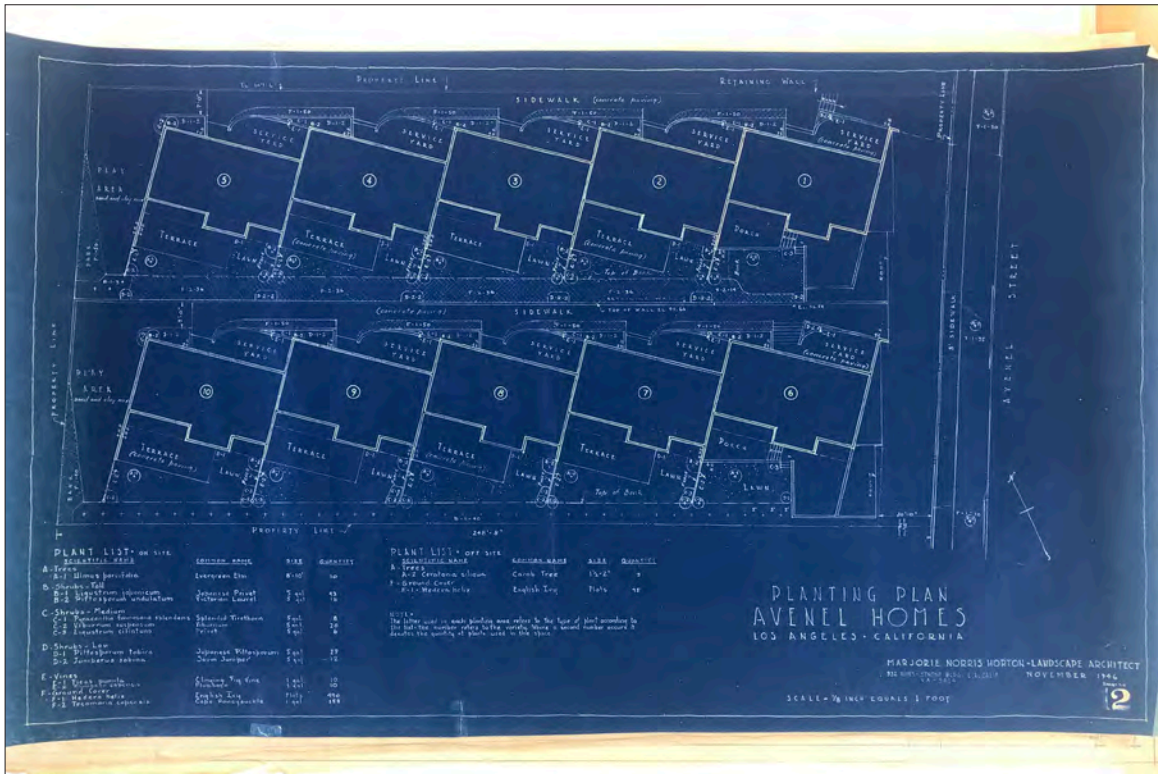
Planting plan for subject property, note landscape architect listed as Marjorie Norris Horton (UCSB Architecture and Design Collections, Gregory Ain papers, 1946)
